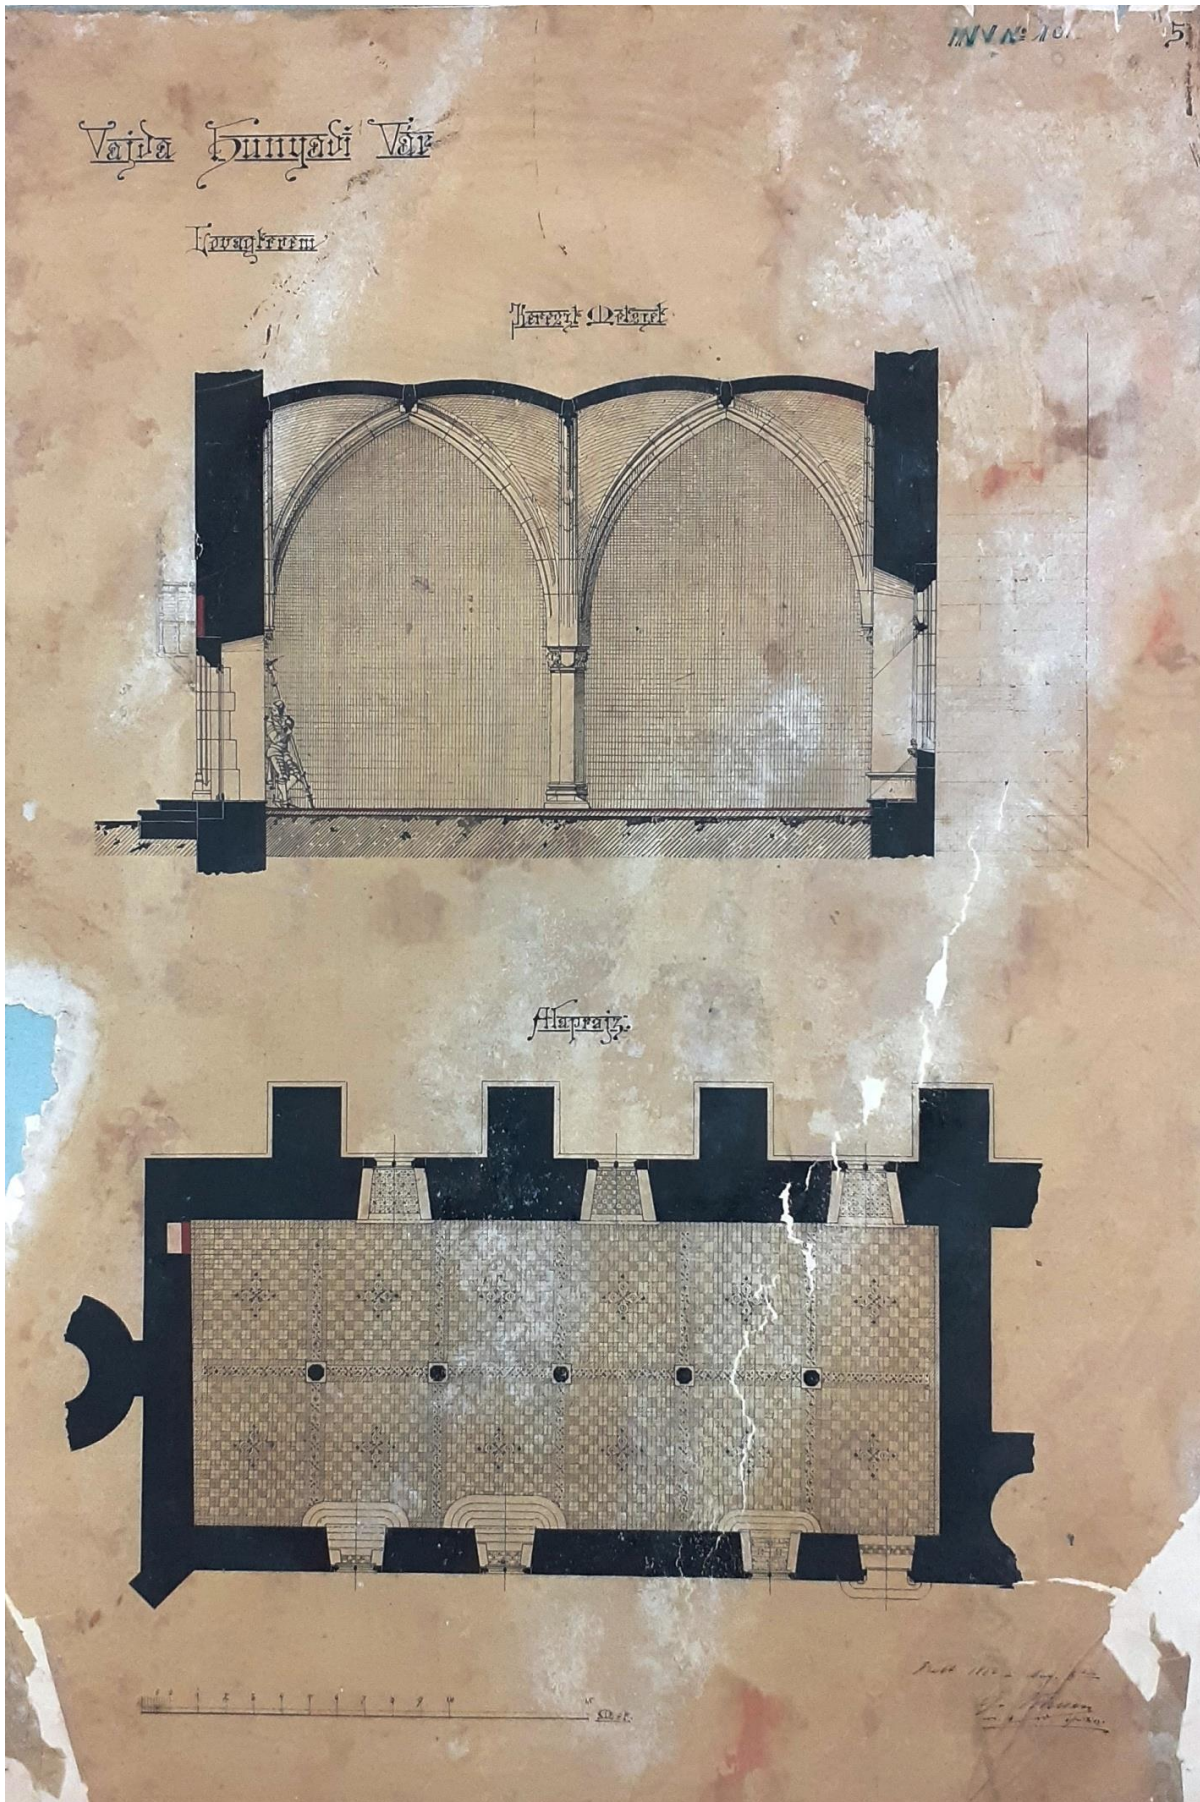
The Knights' Hall, section and plan, Antal Khuen 1882 (MCC archive inv.no. 10)
